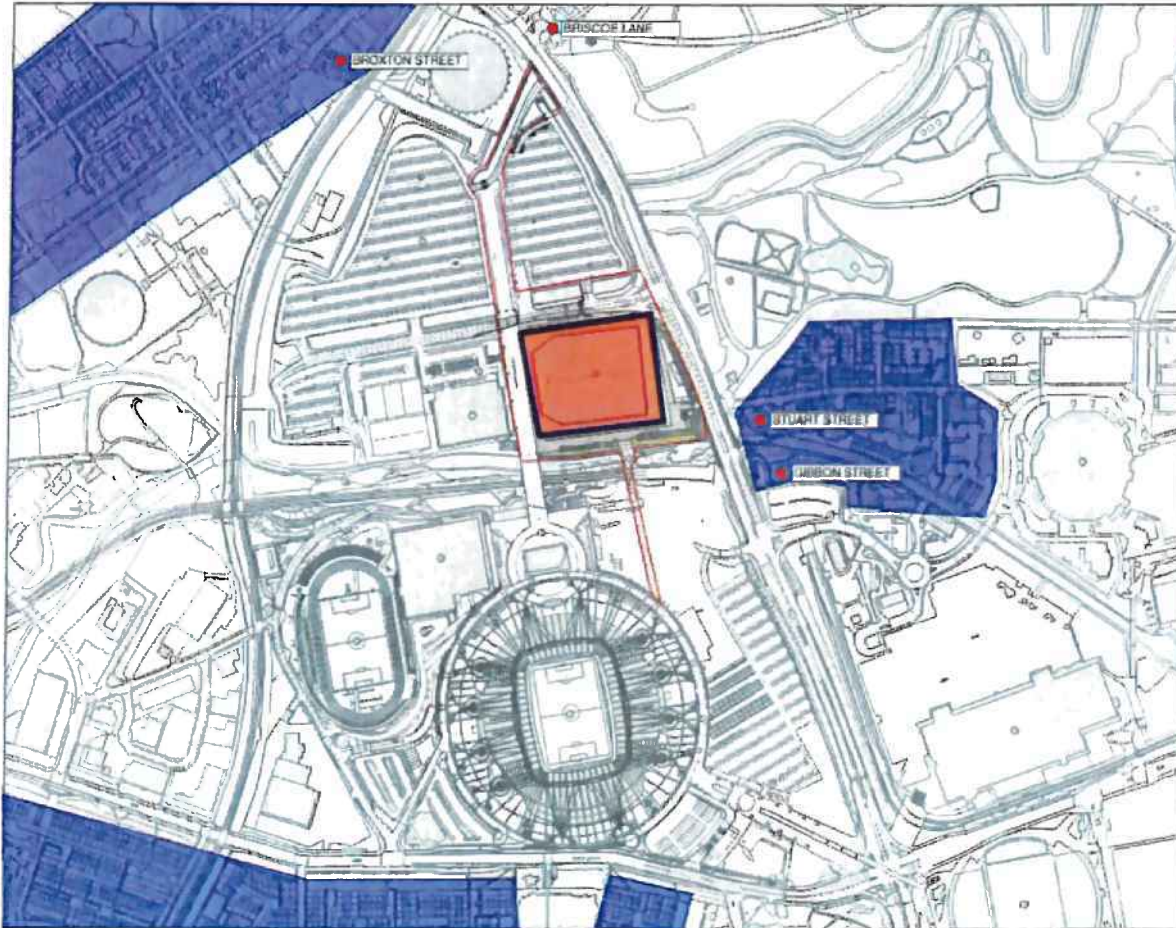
1 Site Location plan (residential areas highlighted in blue)
